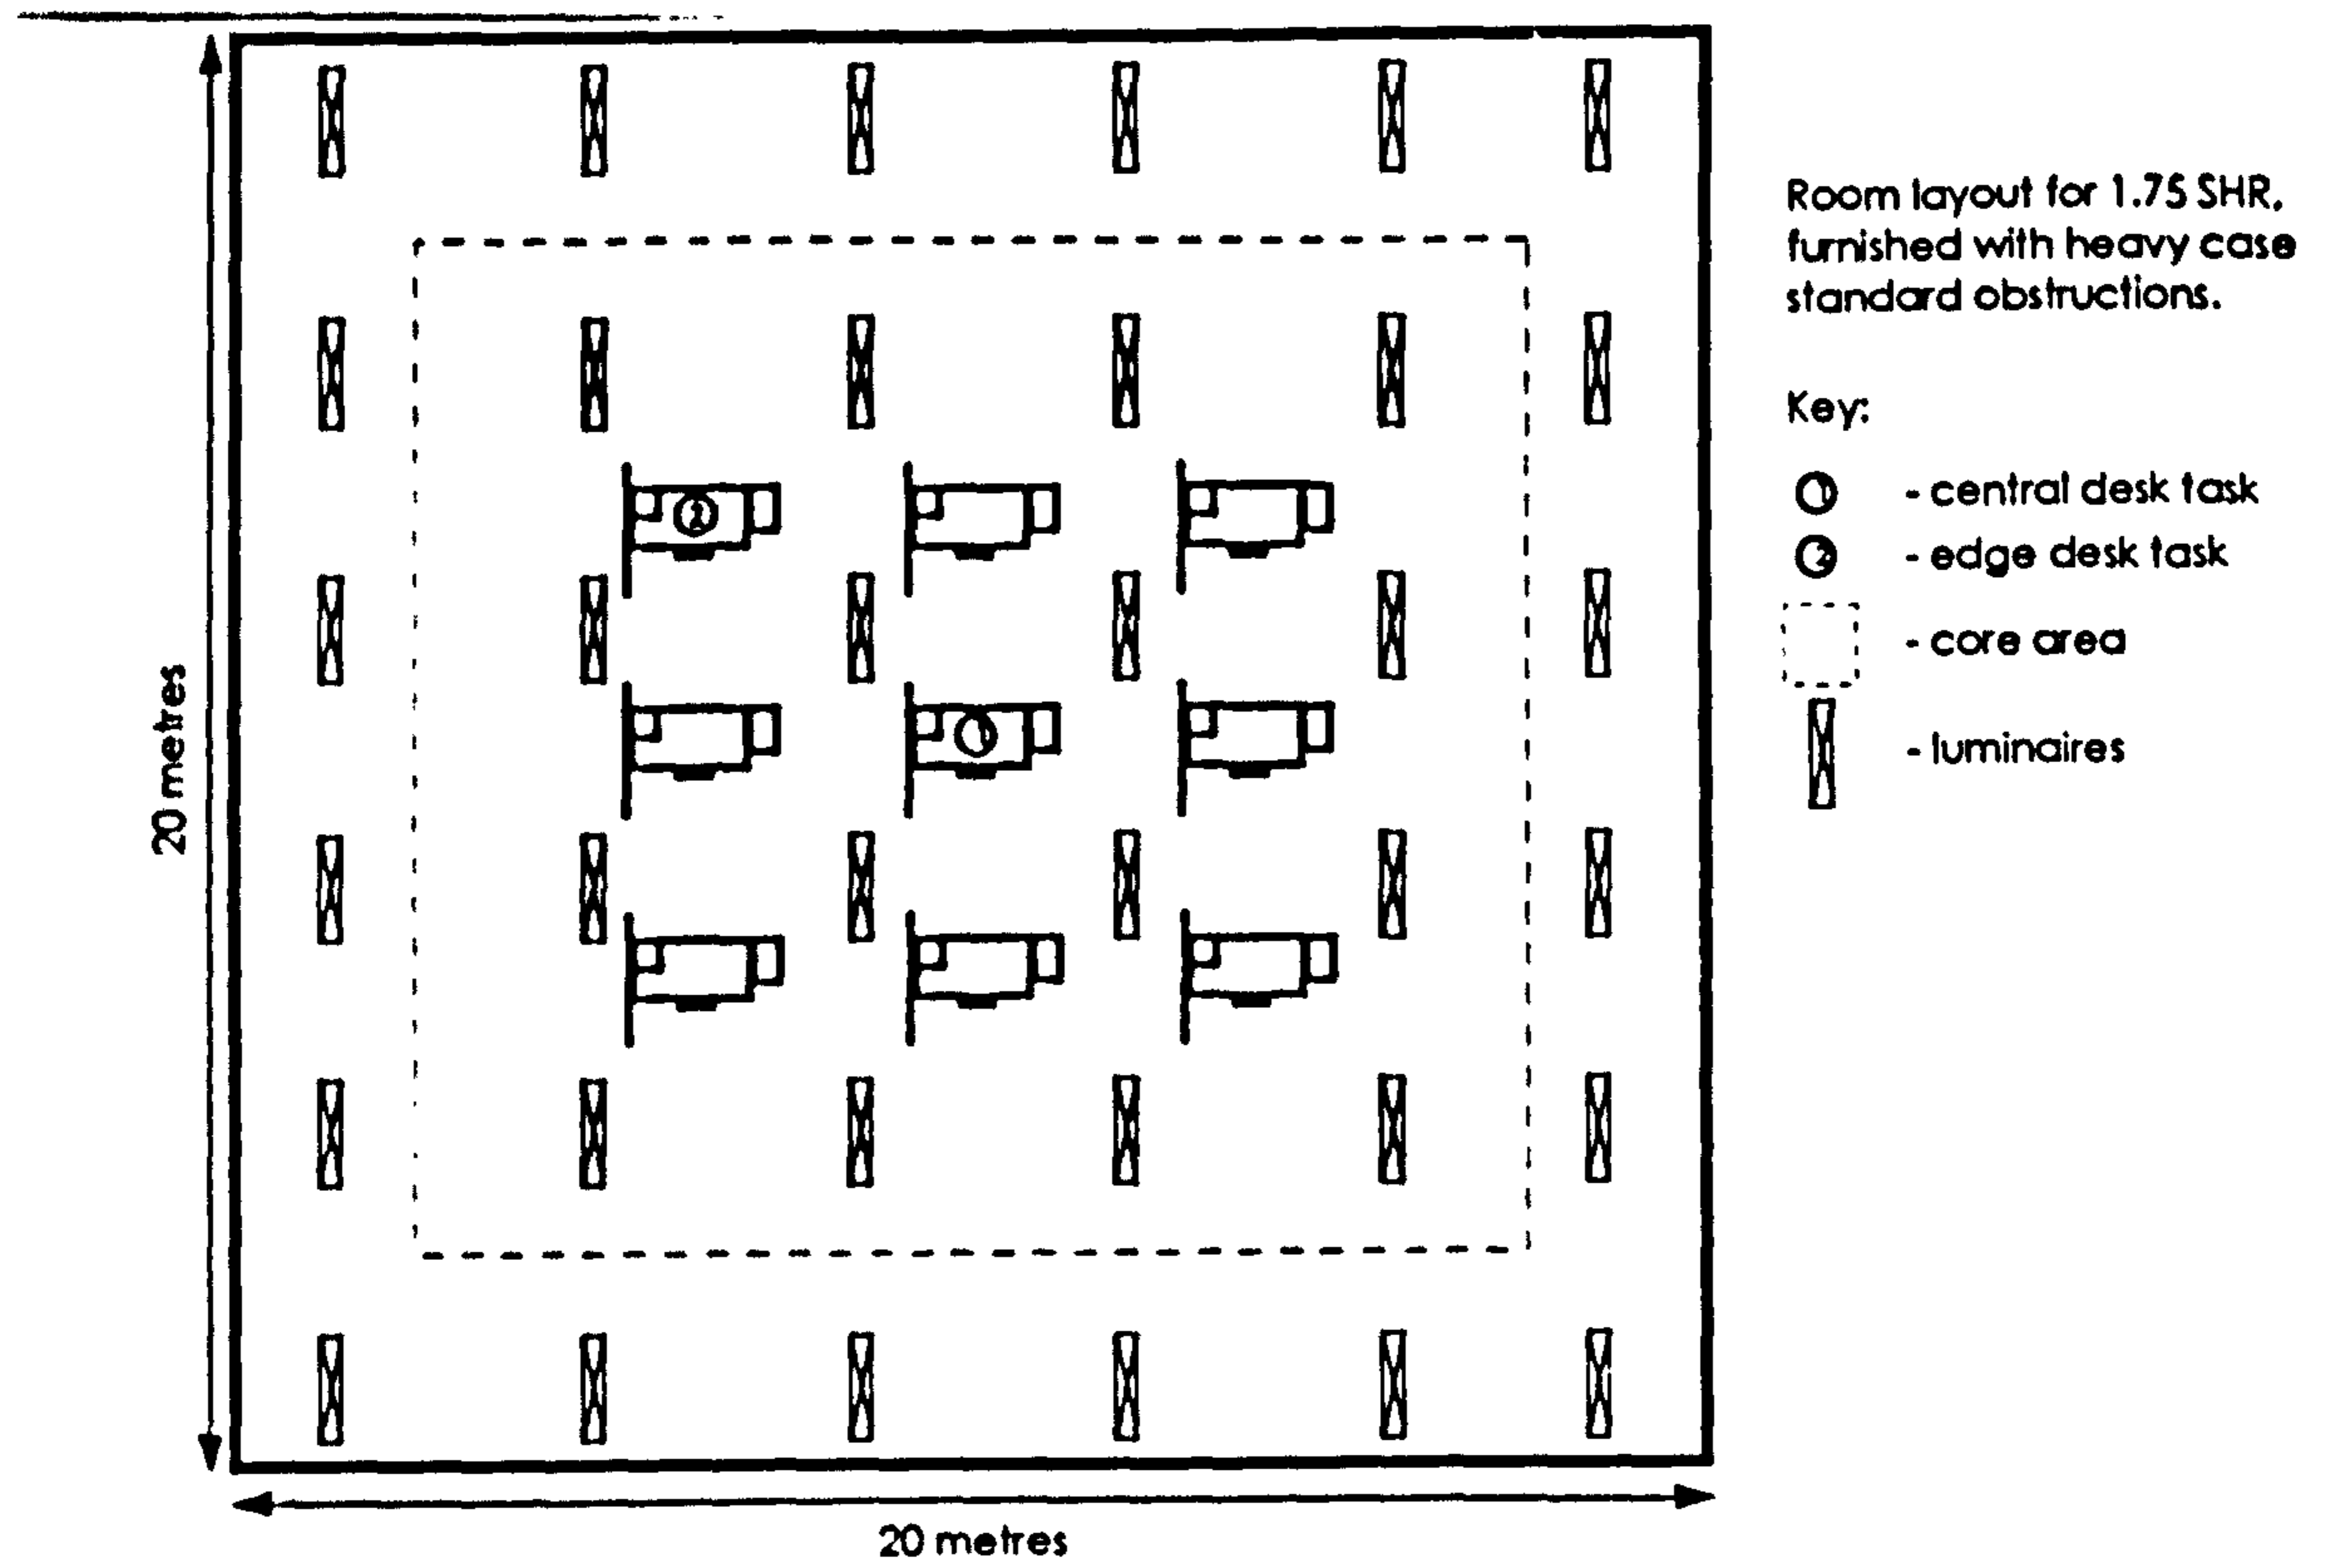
Room layout with heavy case standard obstructions – luminaires at 1.75 SHR
